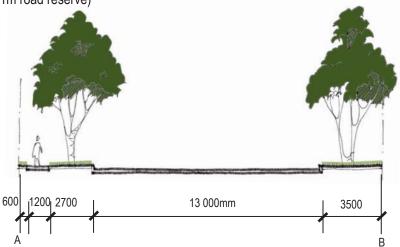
SECTION 4: Road 3 (19.5m road reserve) and Environmental Corridor
